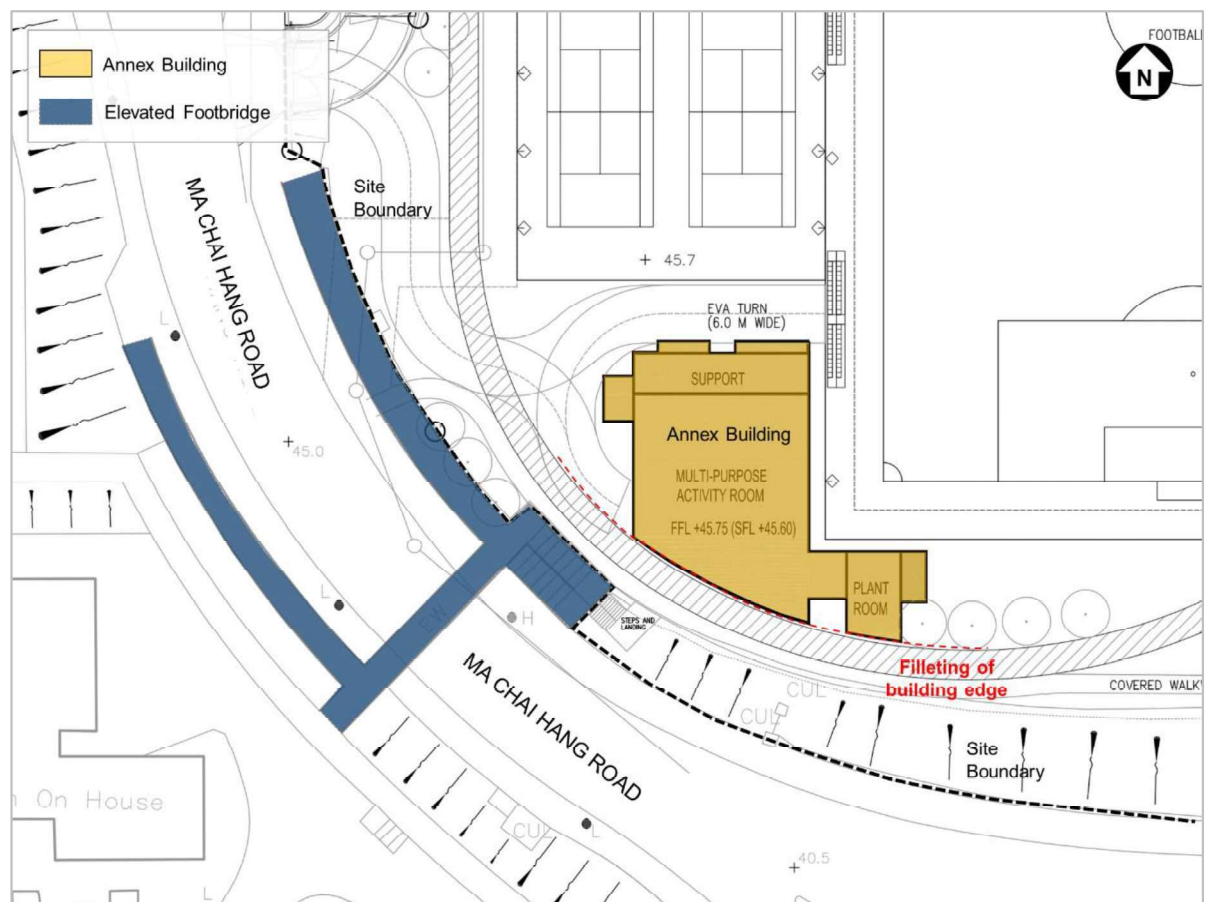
Layout Plan for Annex Building at Ground Floor Level
